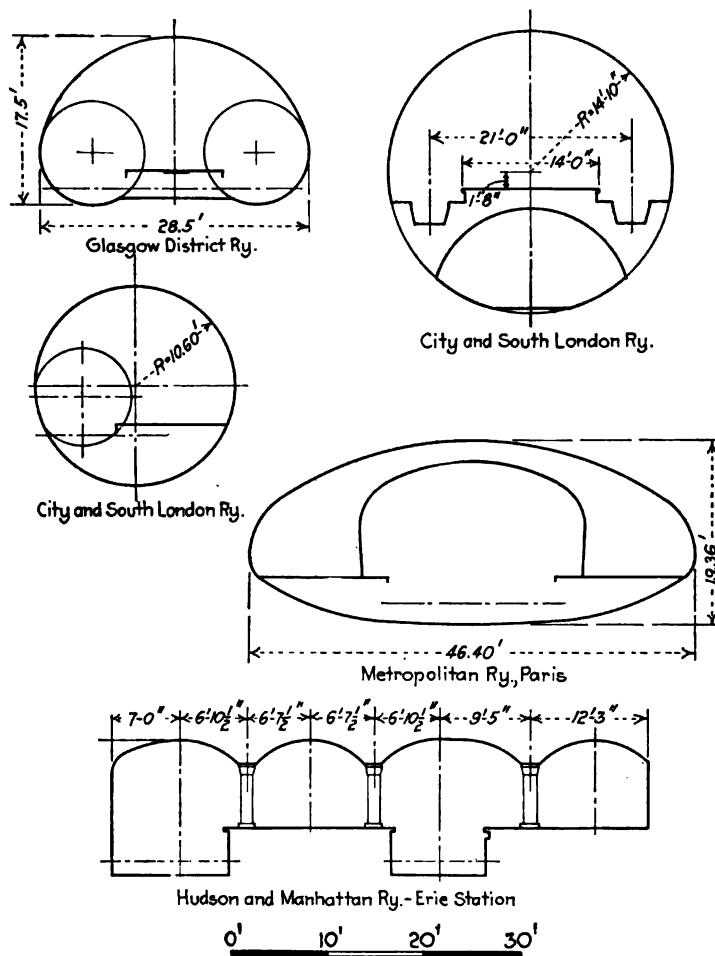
Cross sections of rapid transit railroad station tunnels.
